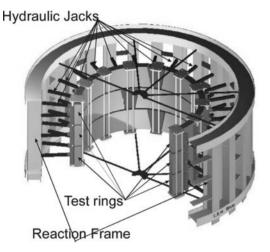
Large-scale tunnel ring testing (by *Bakker & Bezuijen*).
